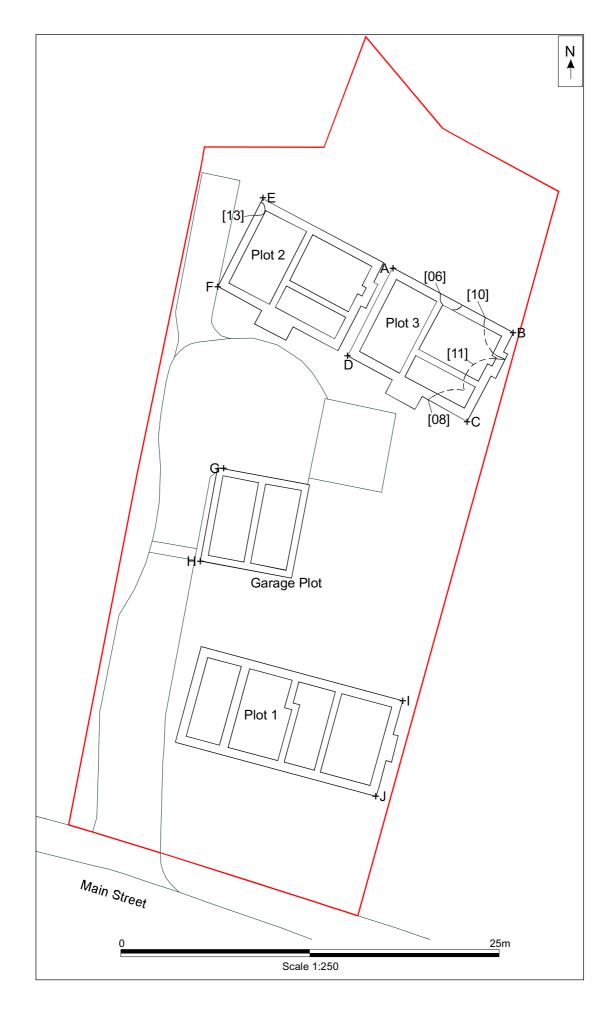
Development plan at scale 1:250, with the site outlined in red. Sections shown on Figure 4
